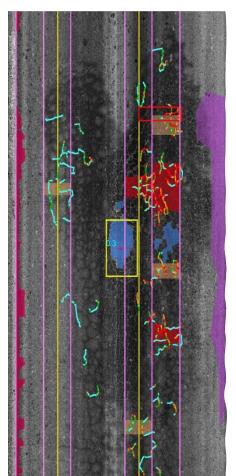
Use of Artificial Intelligence, IoT, Digital Photogrammetry and 3D image highresolution technology by Laser Crack Measurement system (LCMS-2) to detect pavement distresses (UAE, n.d.)
